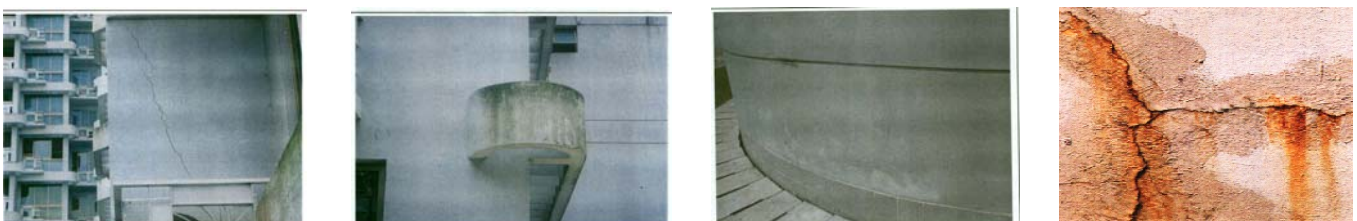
Common defects on external wall surfaces – (from left) cracking, mould growth, efflorescence and rust staining.
